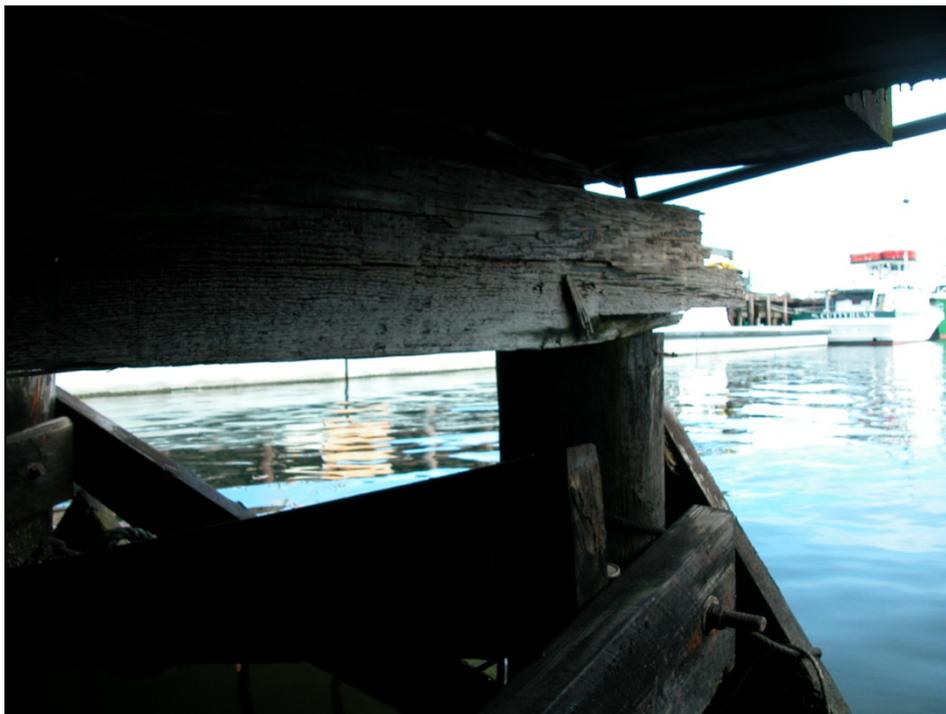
Typical view of the waterside end of the timber pile caps..
